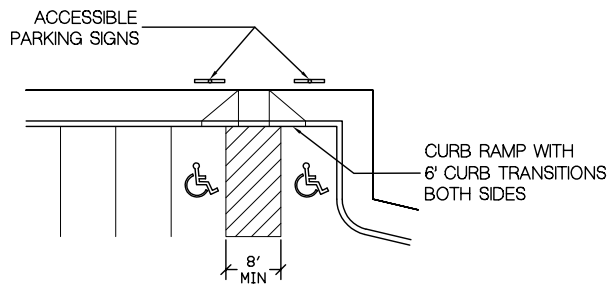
Plan drawing of typical accessible parking spaces with shared access aisle
